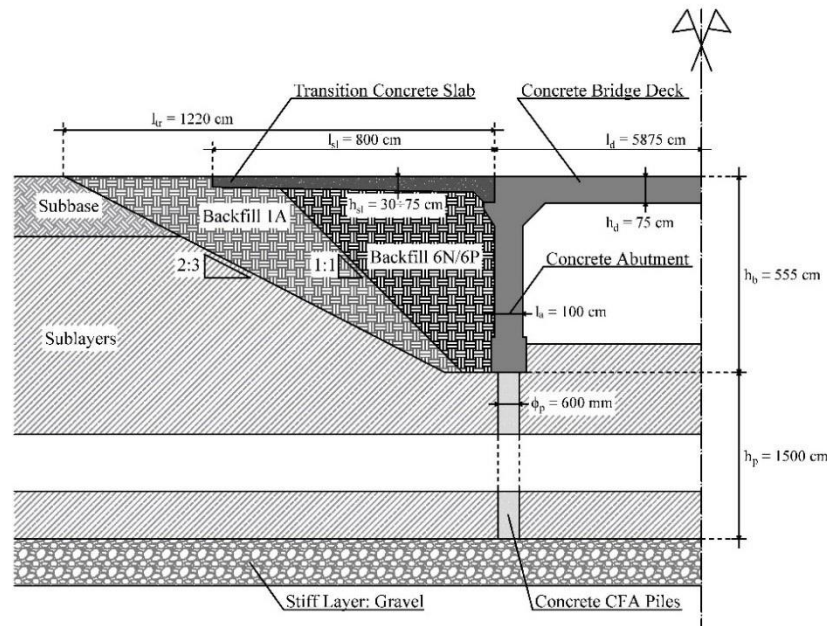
Longitudinal view (x-z plane) of the railway bridge transition.
